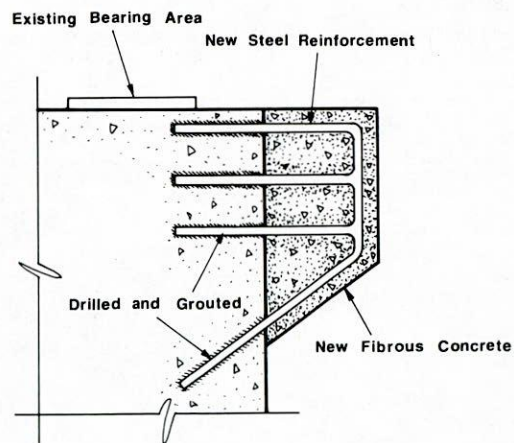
Widening the Bearing Area at an Abutment or Pier Bent
